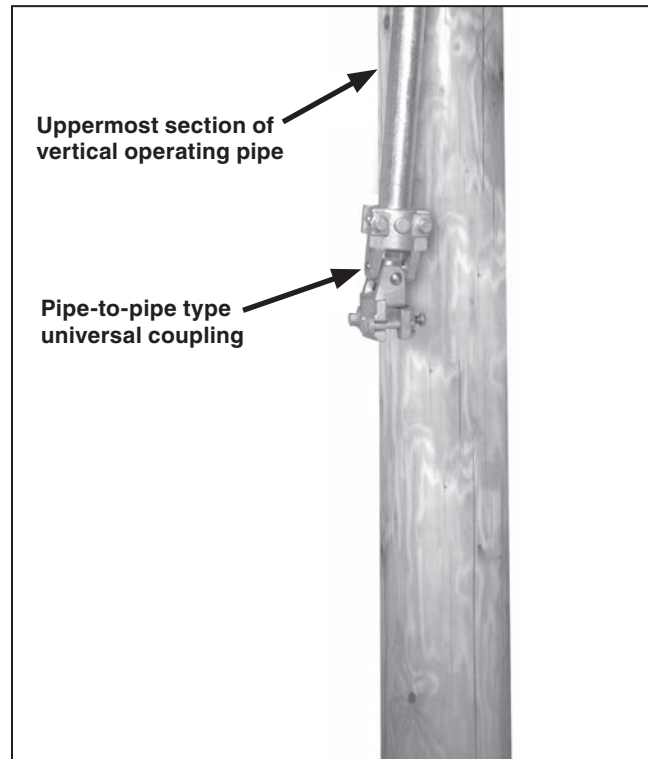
Attach the pipe-to-pipe type universal coupling to the lower end of vertical operating pipe.
